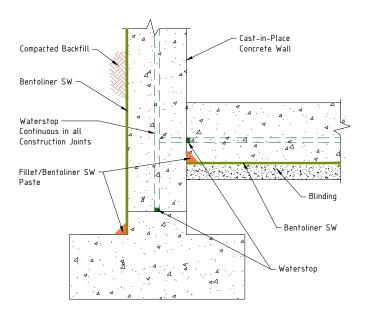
Raised slab detail with concrete blinding at non-hydrostatic condition
